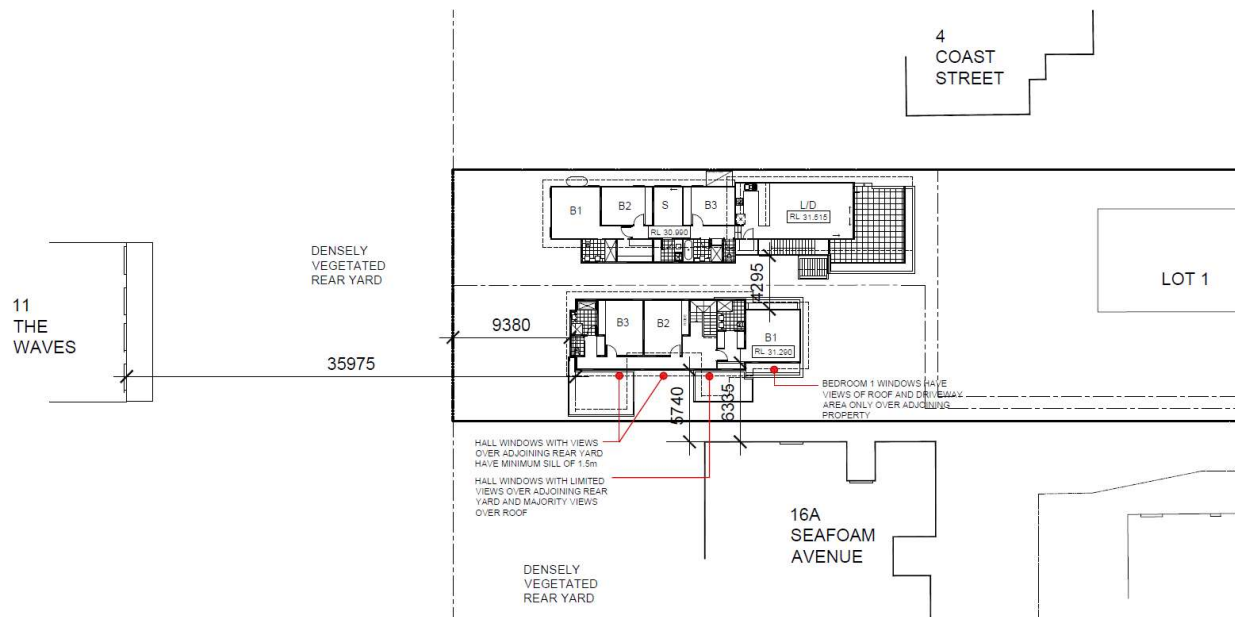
Location of windows with potential to overlook 16a Seafoam Avenue
